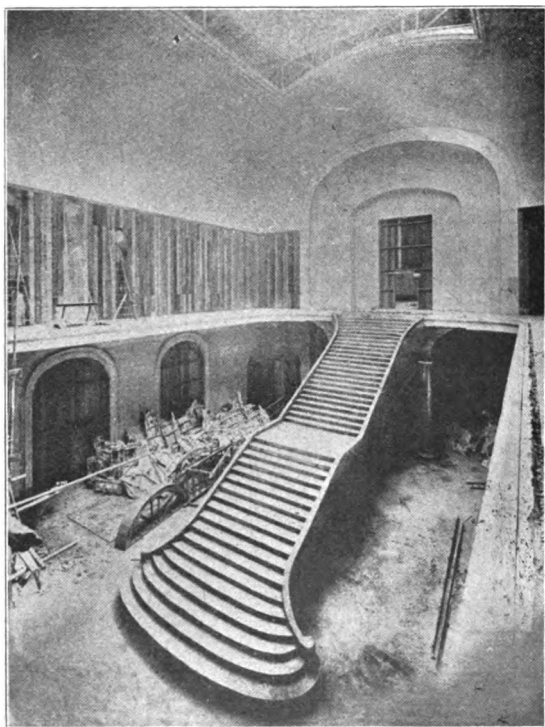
Concrete Staircase, Cantilever Galleries and Ceiling in a Department Store.
